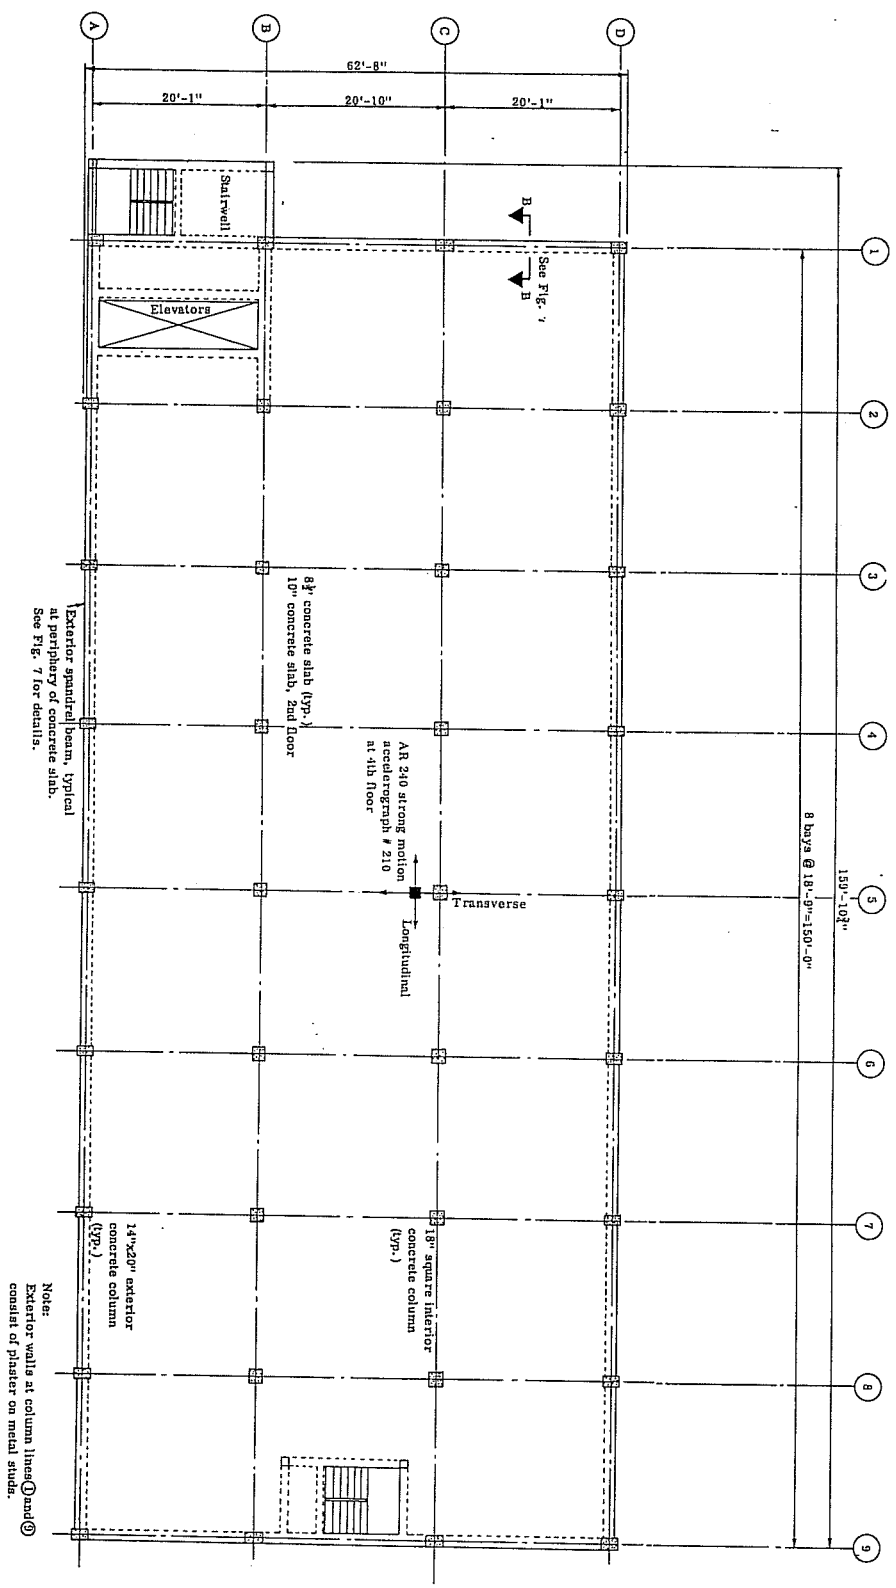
Seven-Story Hotel. Typical Floor Framing Plan⁶⁸
